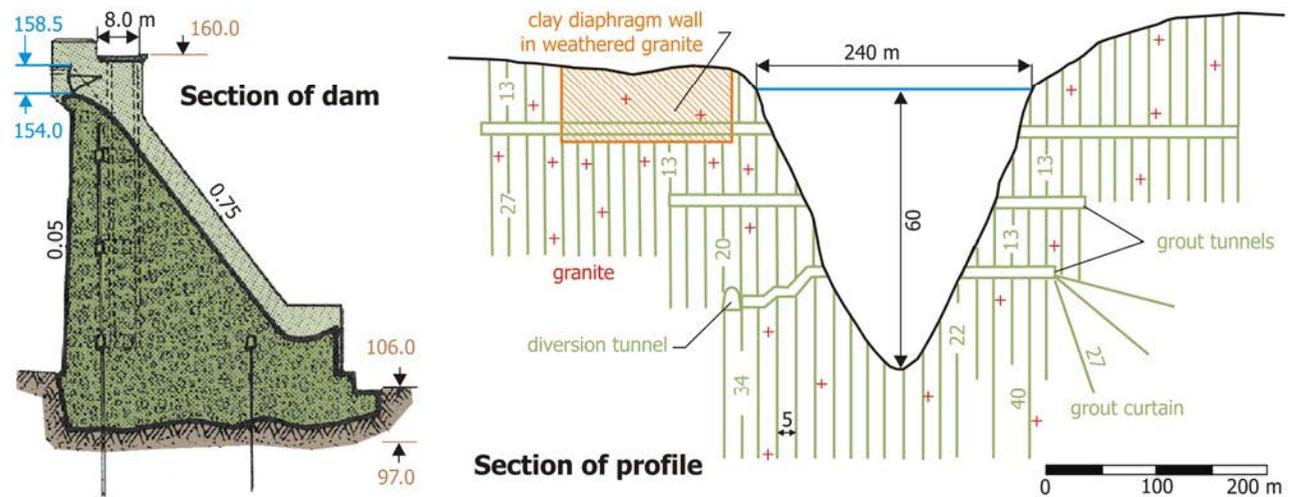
The Boadella Dam - an example of a concrete gravity dam (adapted from "Inventario de Presas Españolas" ICOLD, 1973)
